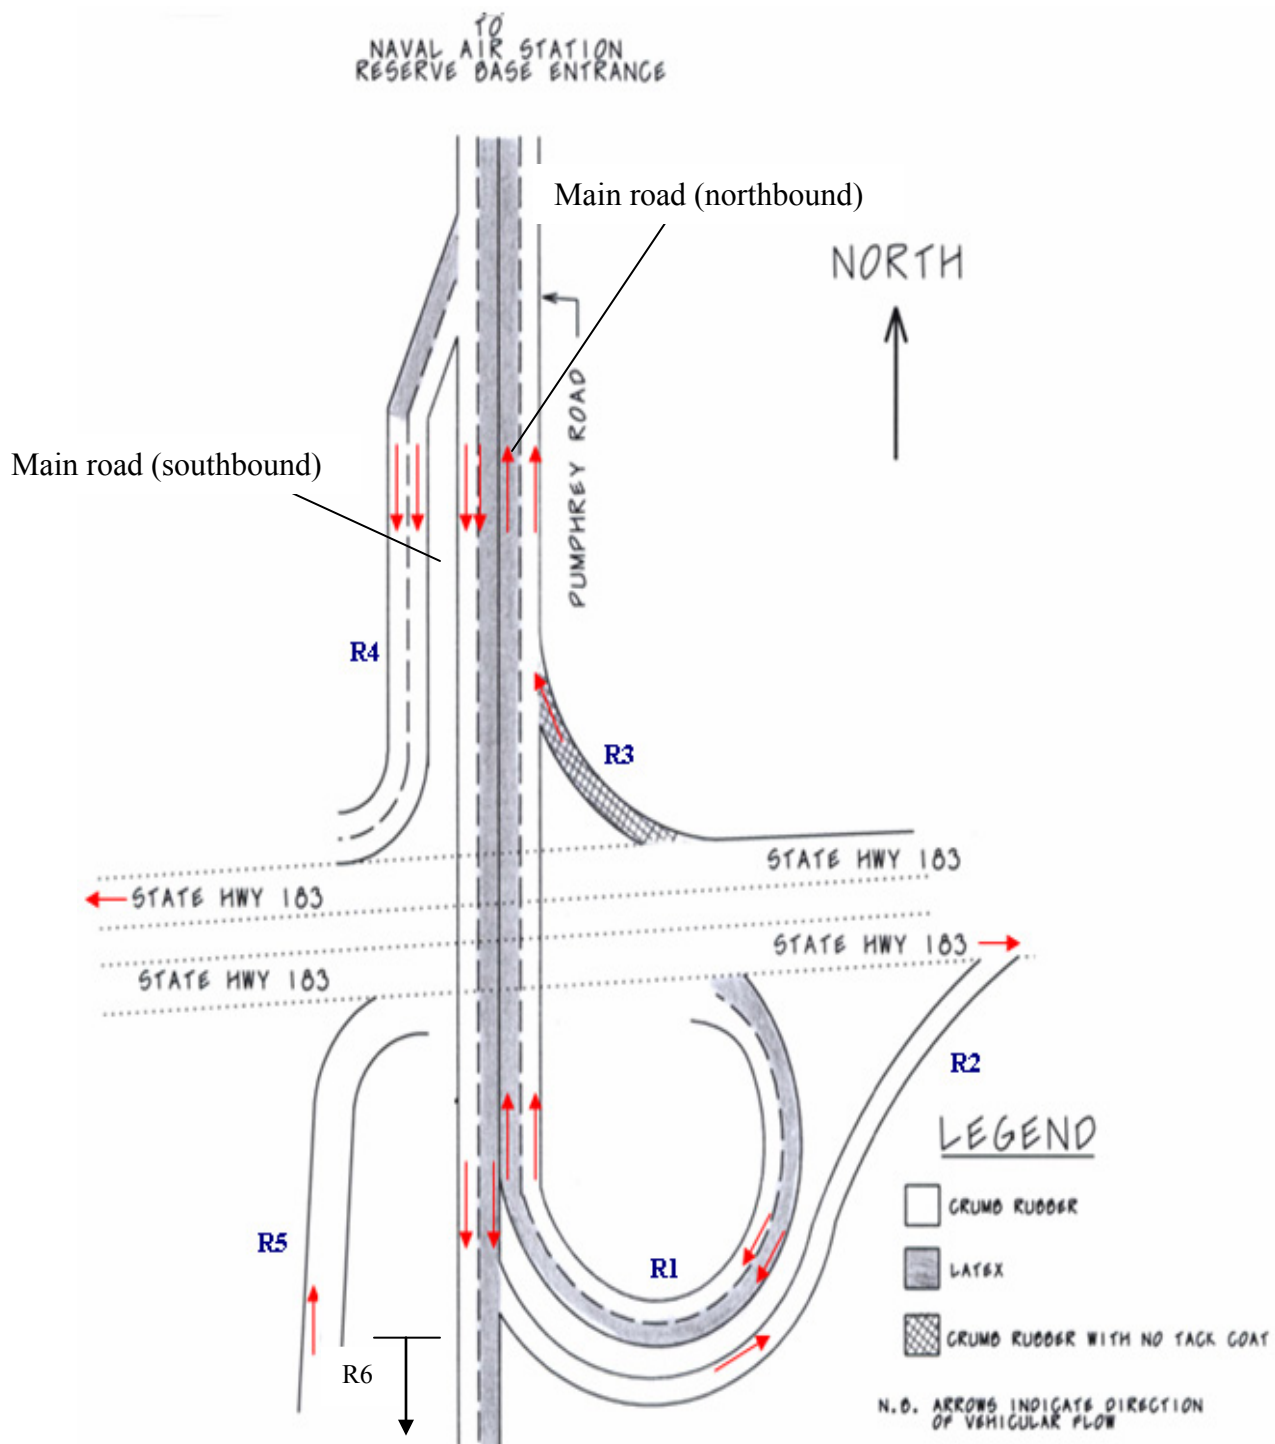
Plan View of Pumphrey Street Sections (drawing not to scale).
